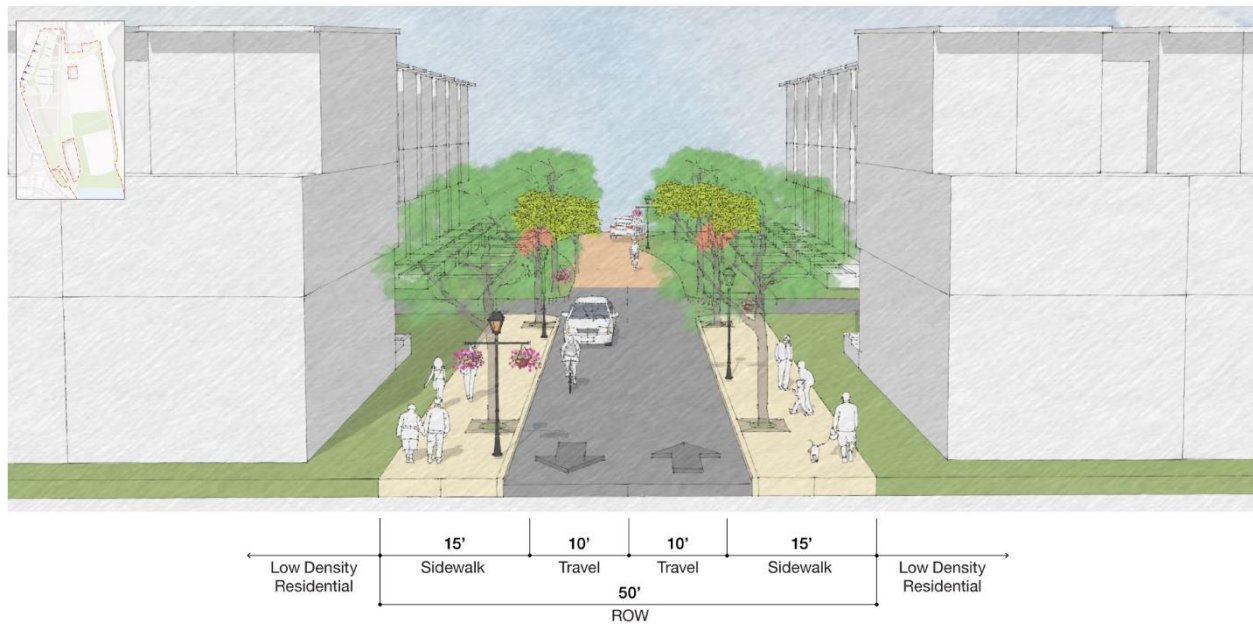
Visitacion Creek North and South Proposed Cross-SectionFigure 3-28: Local Streets Proposed Cross-Section
